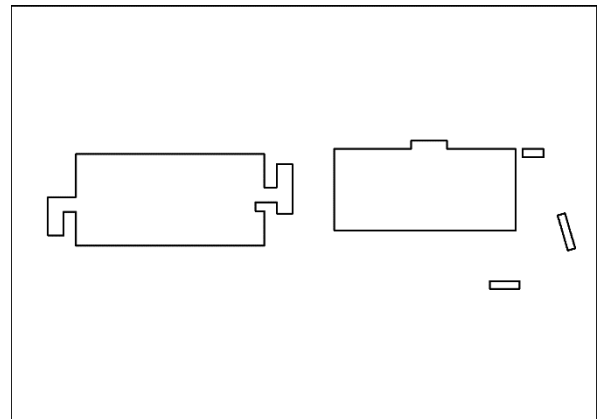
Example of a floor plan of a Brazilian Youth Prison - Form C
